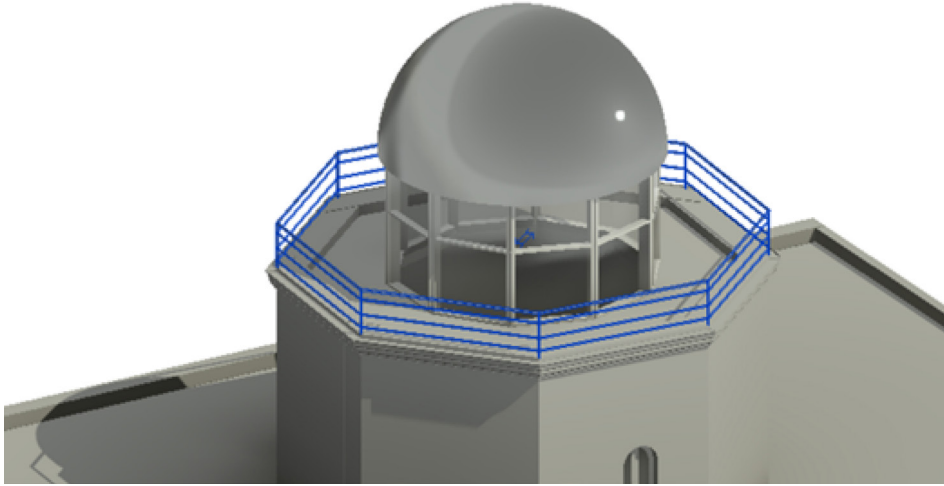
Generic lighthouse: steel handrail with horizontal currents.
